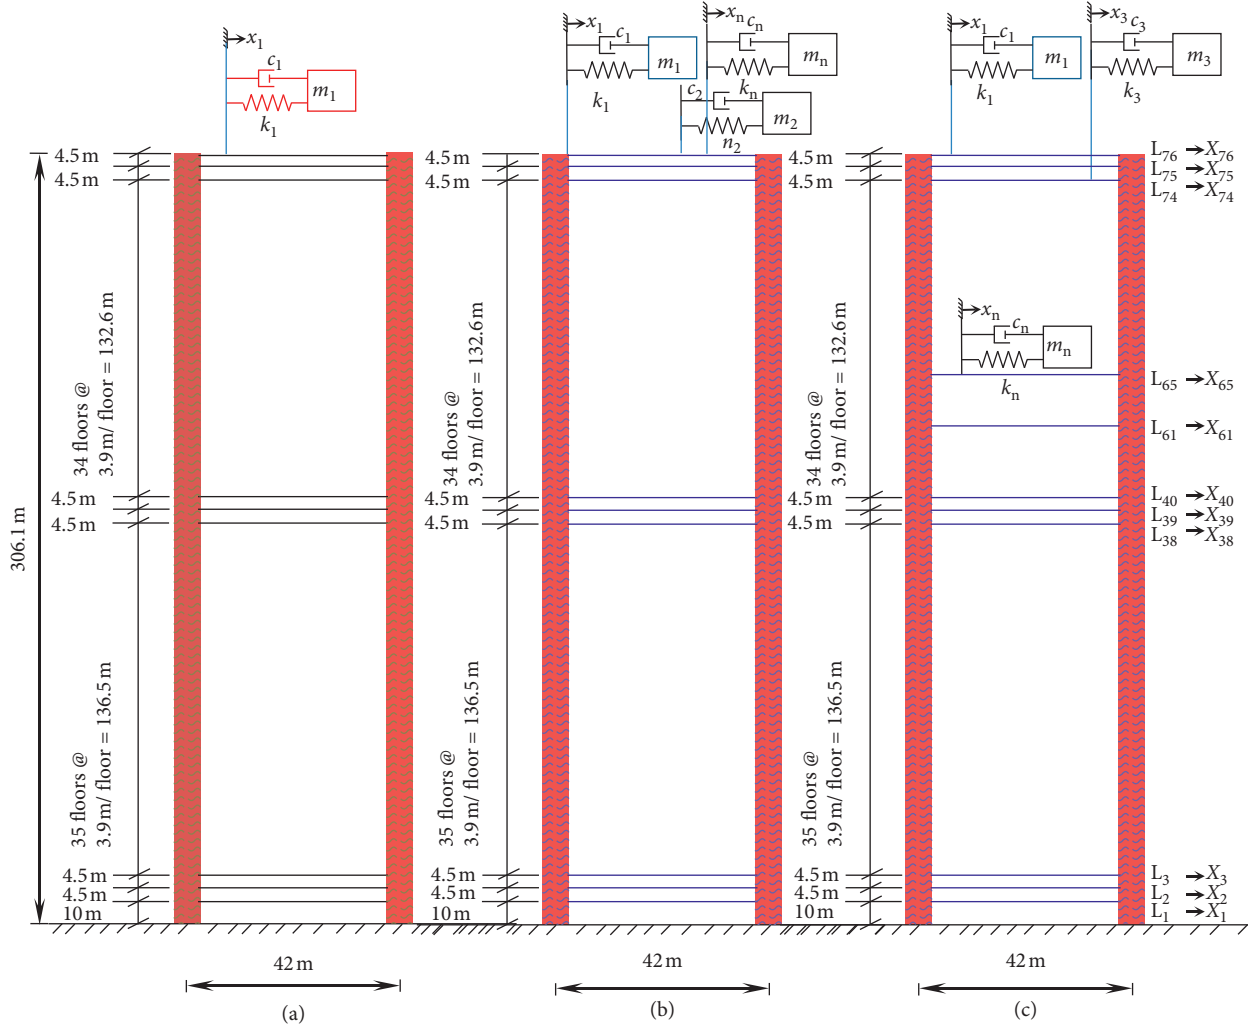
Model of benchmark building (a) installed with STMD, (b) installed with MTMDs, and (c) installed with d-MTMDs.
